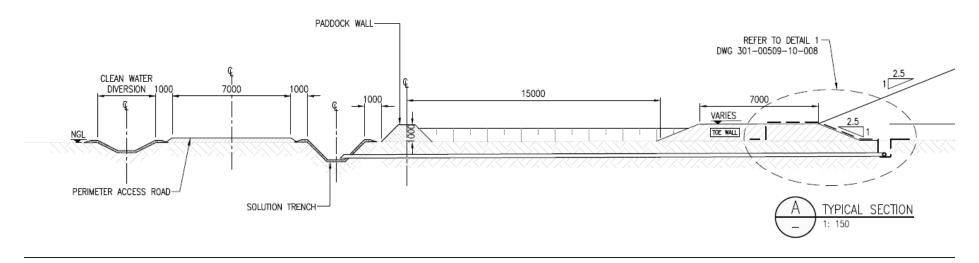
Typical detail of TSF Paddocks and Clean and Dirty Trenches
